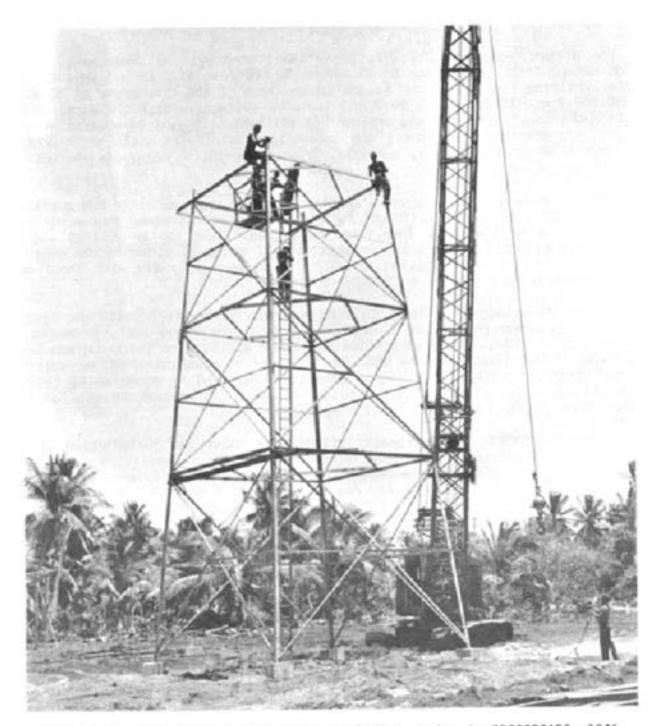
Erection of photo towers on Bikini, prior to CROSSROADS, 1946.
